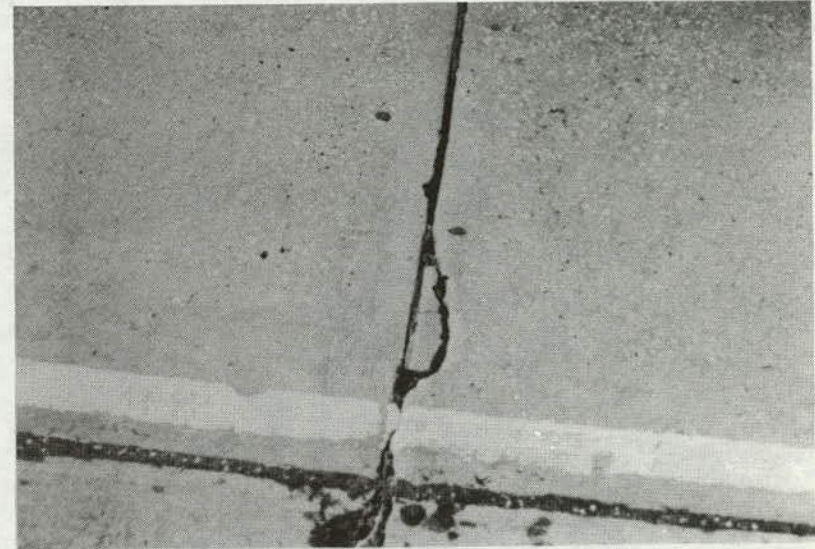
Low-Severity Spalling (Transverse Joint).
